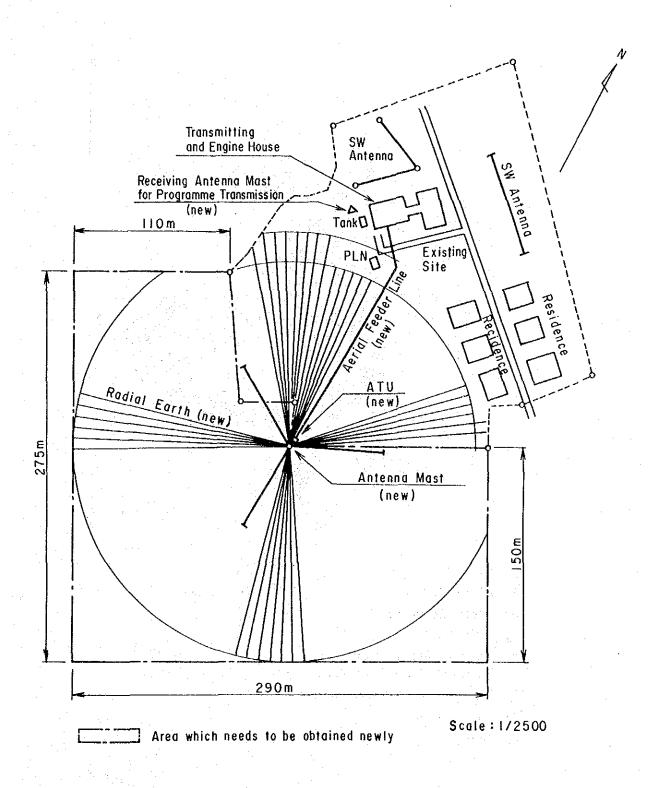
Ternate Transmitting Station; Site Plan - I
